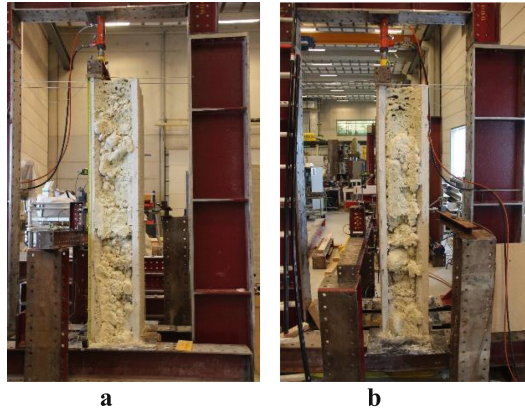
a, b Test set-up with load on the outer and inner face of element 2.5-2, respectively.
